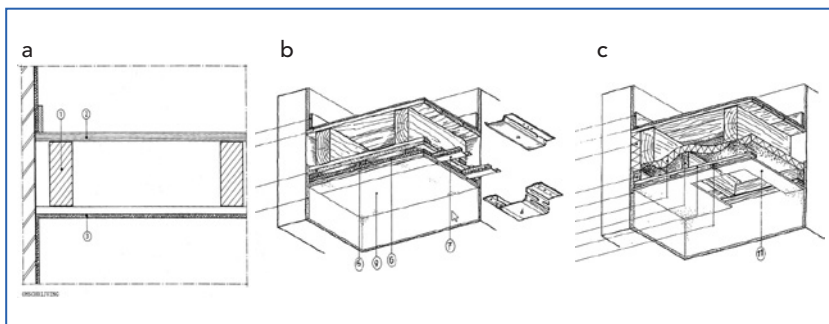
a. The original wooden floor in dwellings and apartments till 1950 and b. the renovation between 1975 and 2003 with a flexible extra ceiling. c. There is also an alternative with the original ceiling removed (see Hartman 1980).
